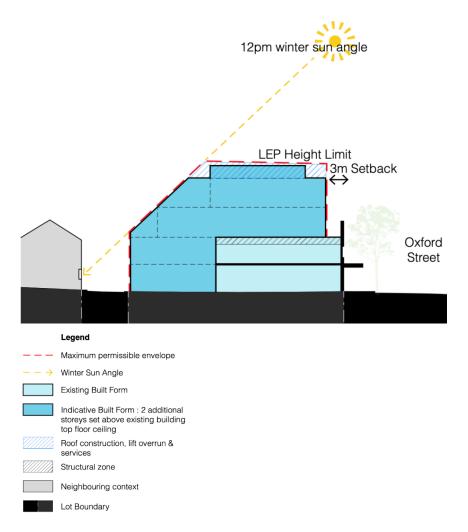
Building massing to rear boundaries is to ensure solar access to the windows of any dwelling, 5.X.4.3(7)
